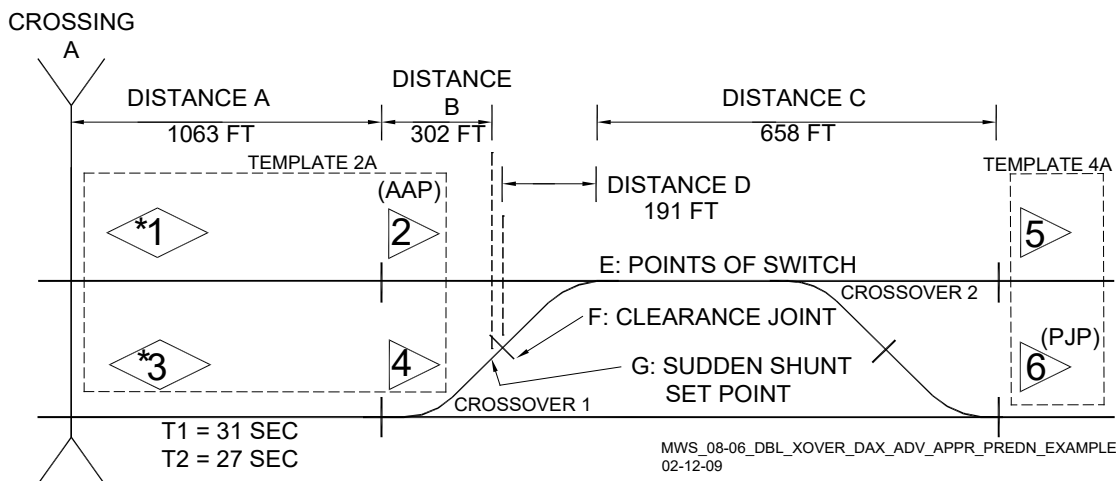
Example Remote Double Crossover Using Adv Appr Predn
